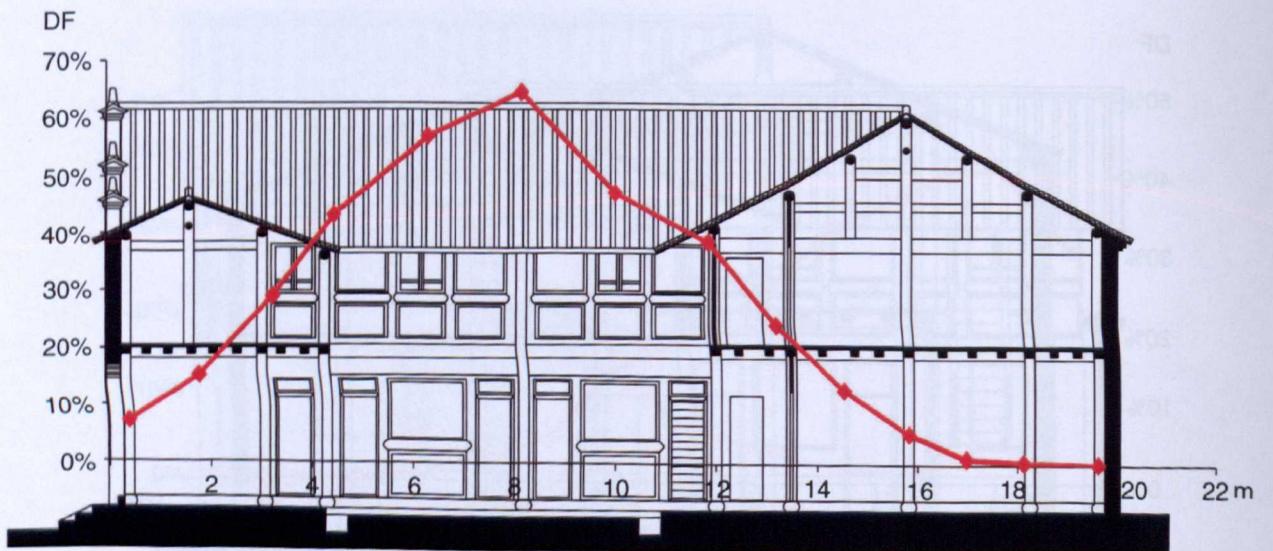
Section showing DF at 1m above ground floor level of Gaozuo dwelling
